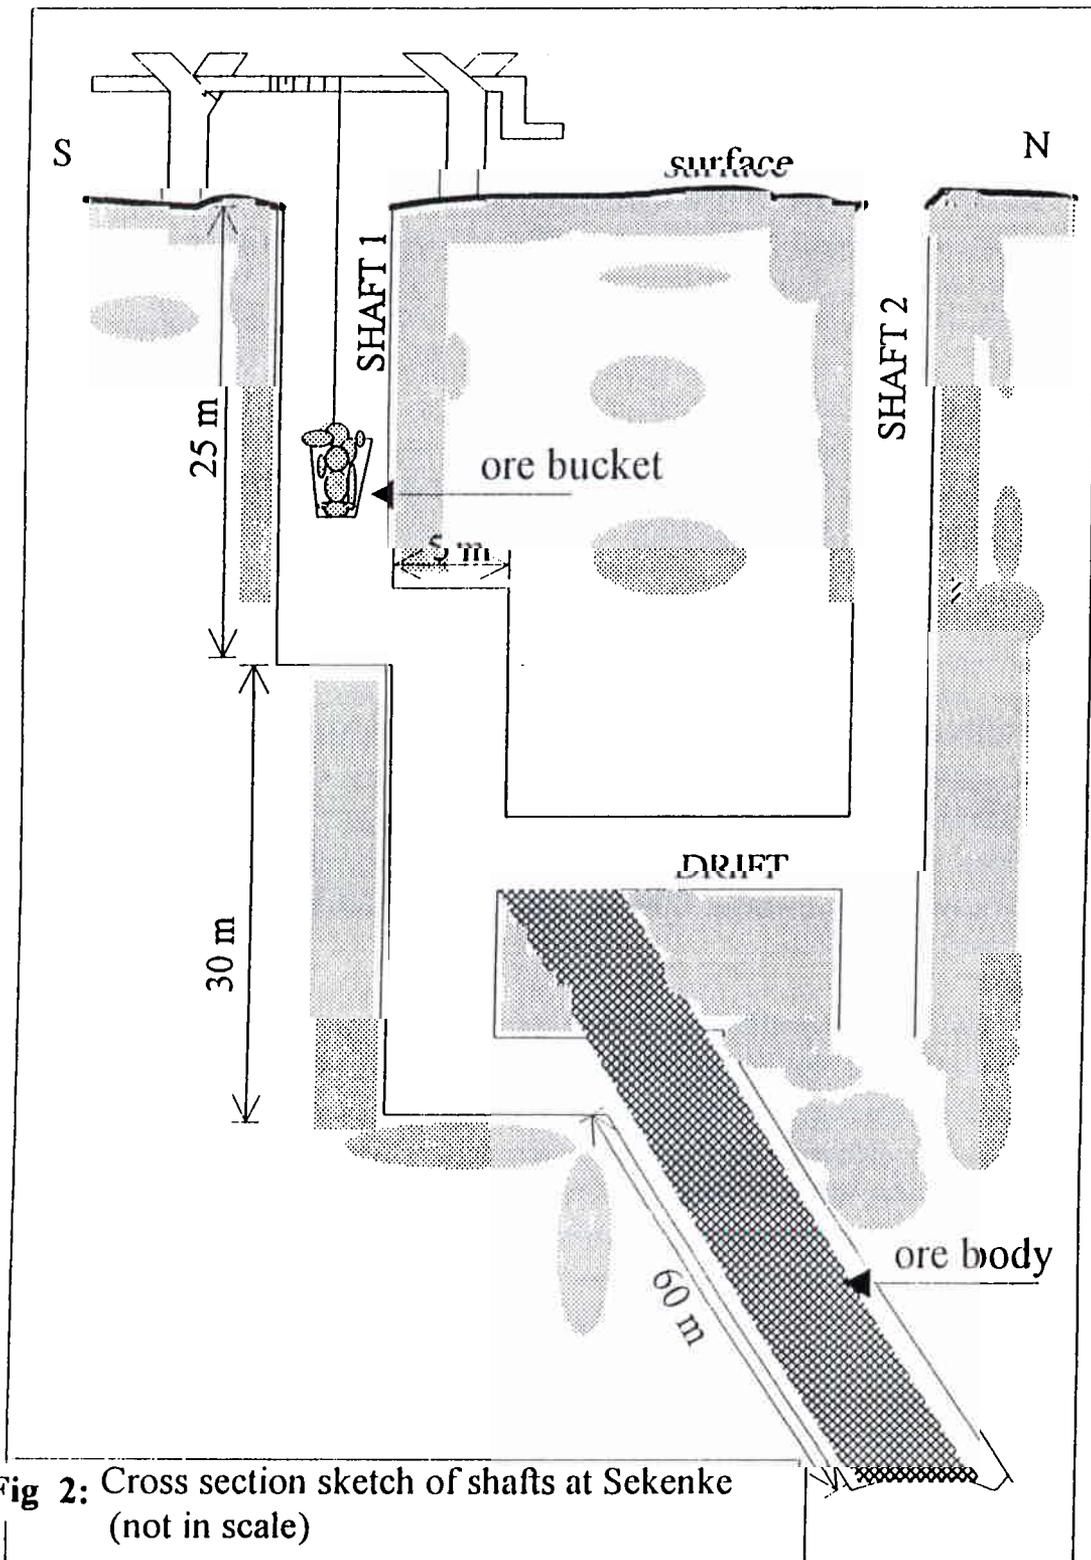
Cross section sketch of shafts at Sekenke (not in scale)
